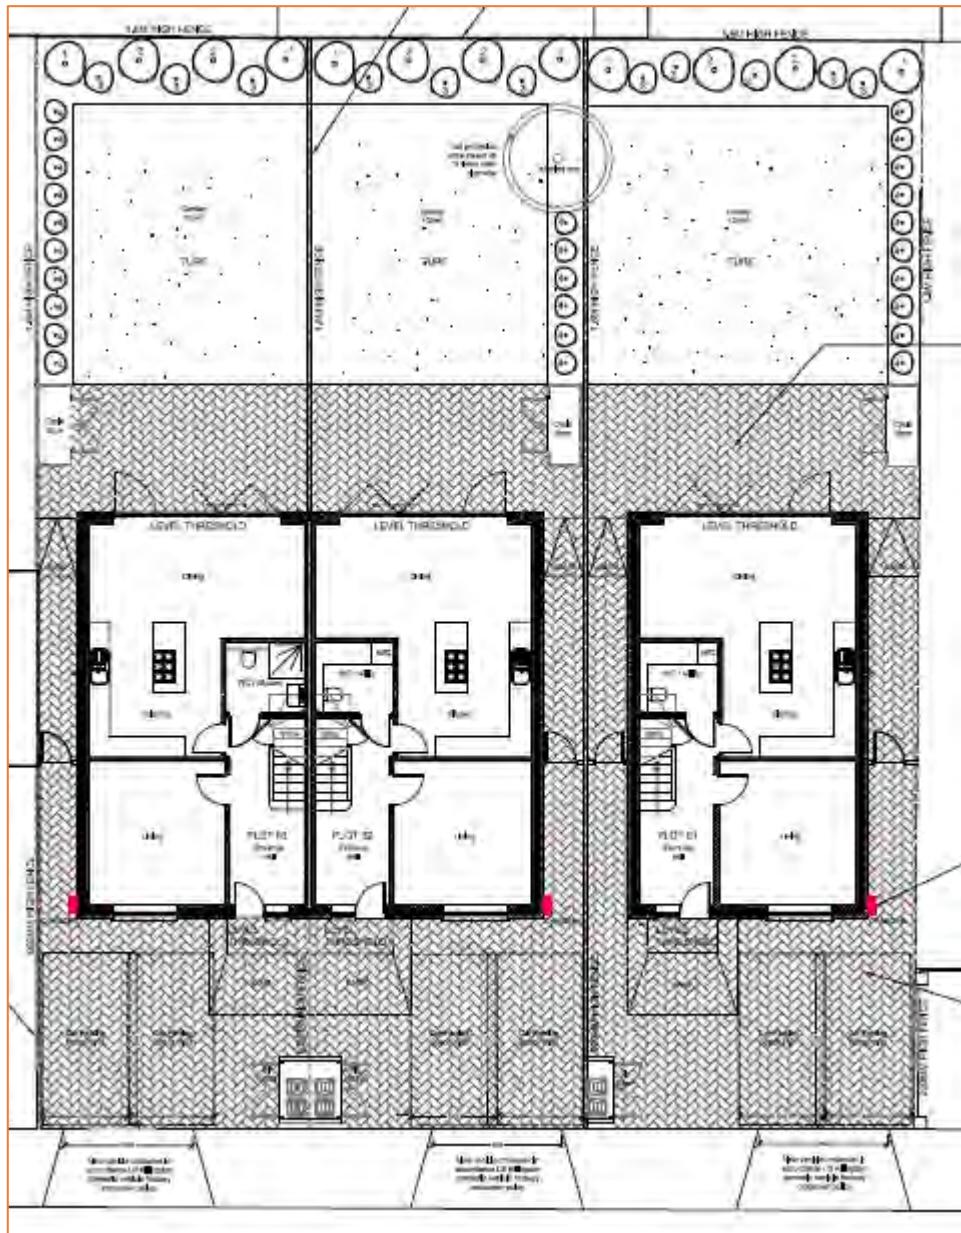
Proposed Site Layout Plan (Source: Bernard Murray Design)
